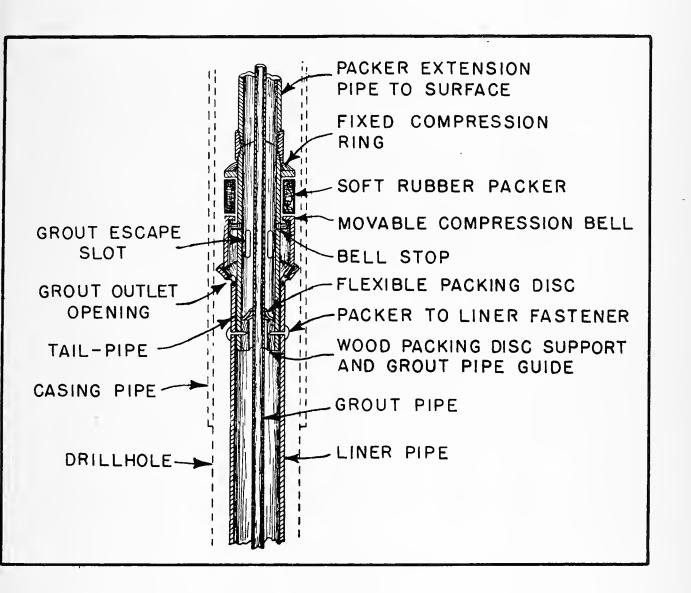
Detail of Packer Assembly for Setting a Heavy Liner Pipe.
